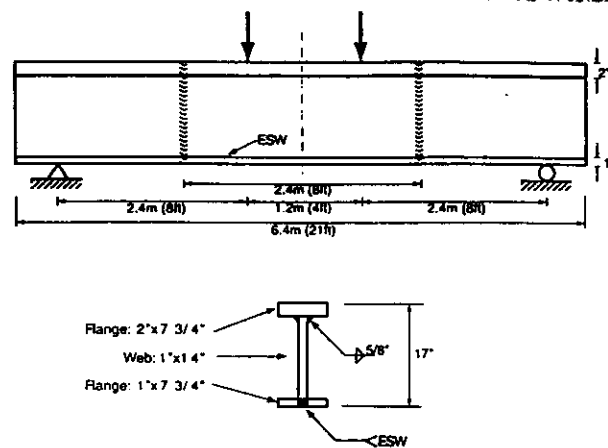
Fatigue test setup to evaluate the web-to-flange electroslag weld T-joint.
